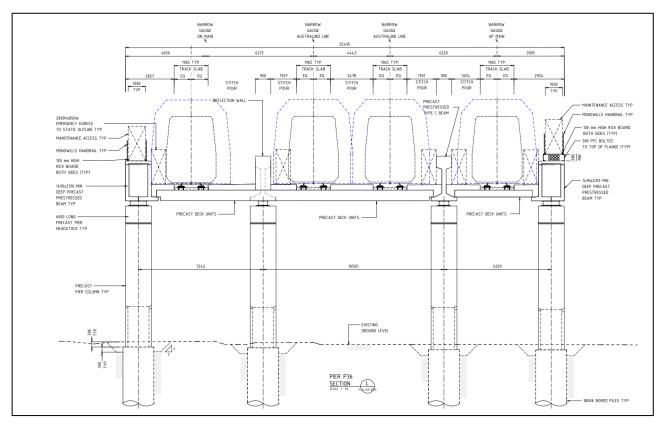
Section of Proposed Viaduct in Detail (Station Precinct)
